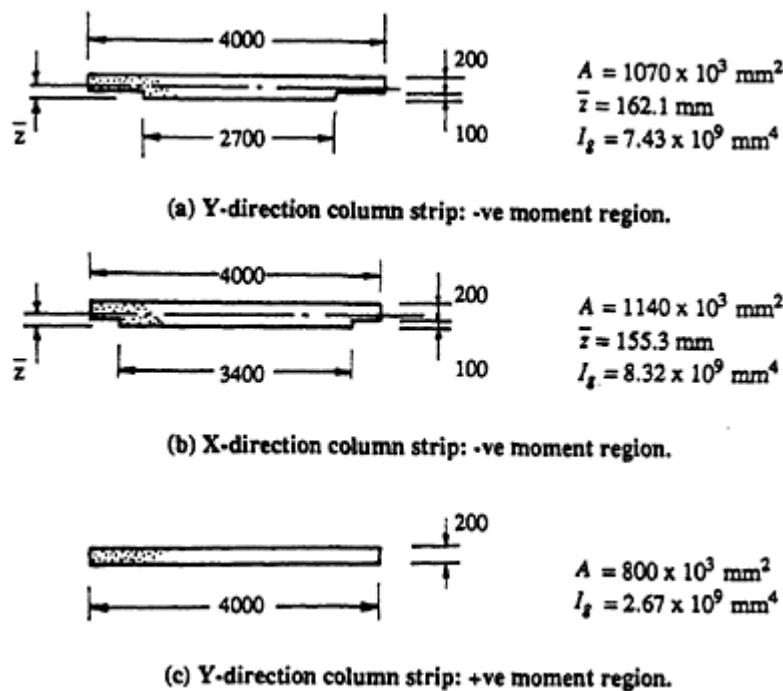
Cross-sectional properties of column strips in [Example 11.4](#).
